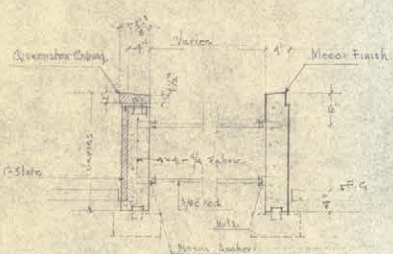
TYPICAL SECTION - 1/2"=1'
